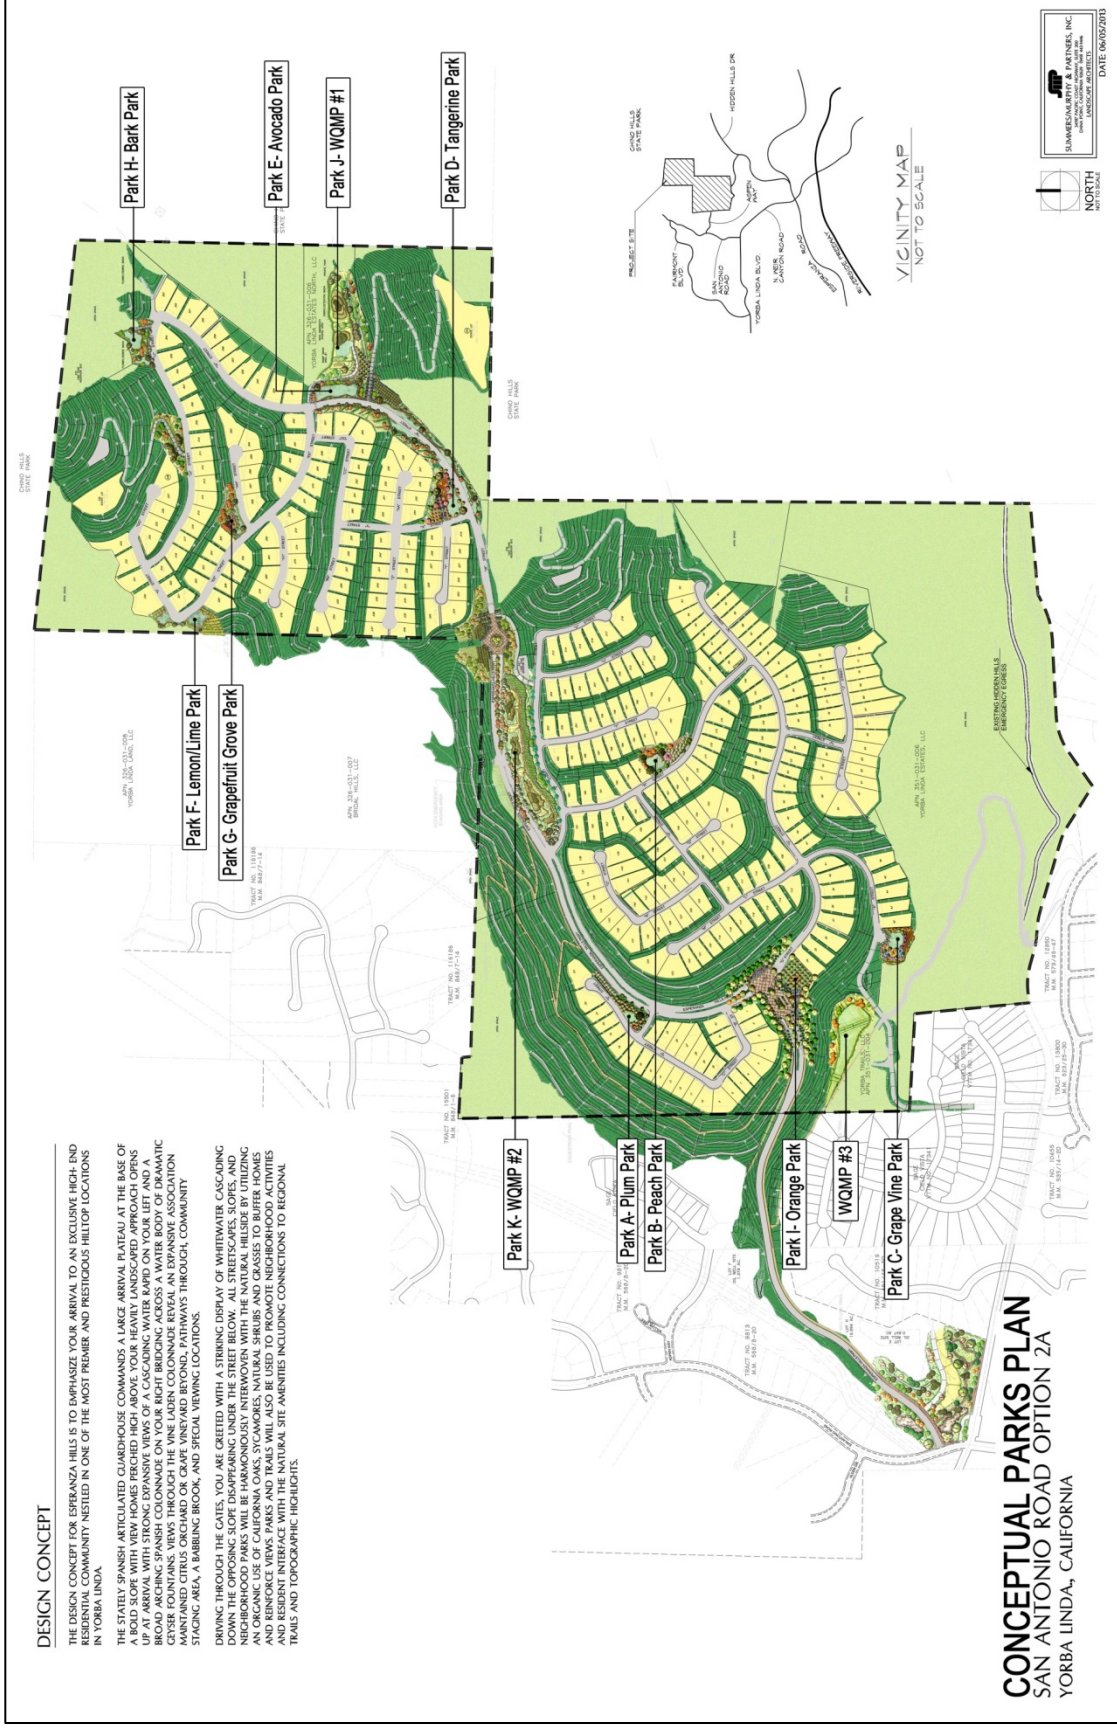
Conceptual Parks Plan, San Antonio Road Option 2A
